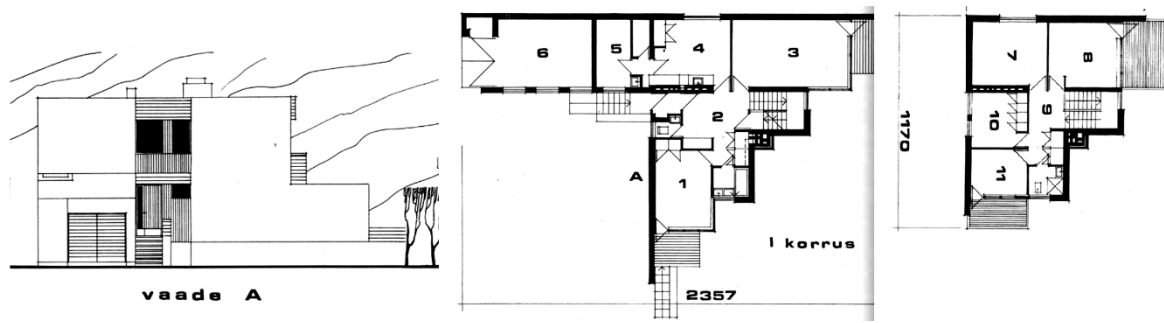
Project 6-03-81, an example of a partly two-floored dwelling from 1981 (left to right: elevation; ground floor; upper floor) (Asszonyi & Amjärv, 1981)
